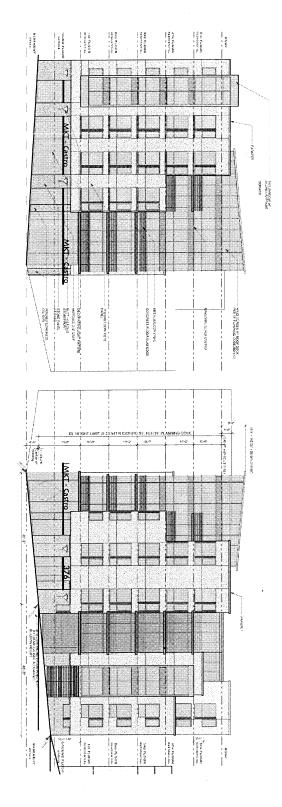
Proposed Elevations Source: Sternberg Benjamin, January 2011 (not to scale)
